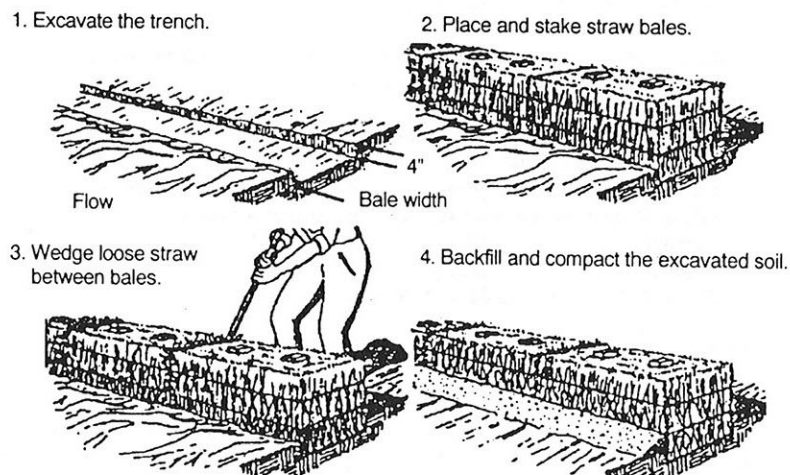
Constructing a straw bale barrier to slow runoff and prevent erosion.
